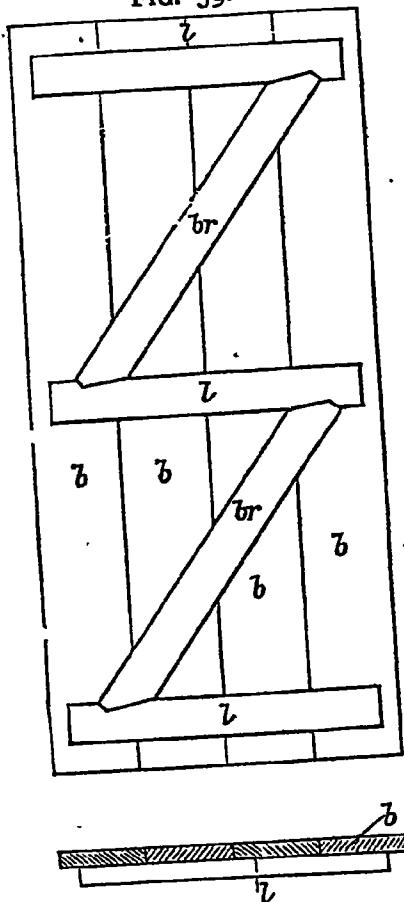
shows an inside elevation and plan of a ledged and braced door; b l are boards; br braces; l, l, ledges. Scale = $\frac{1}{10}$.
